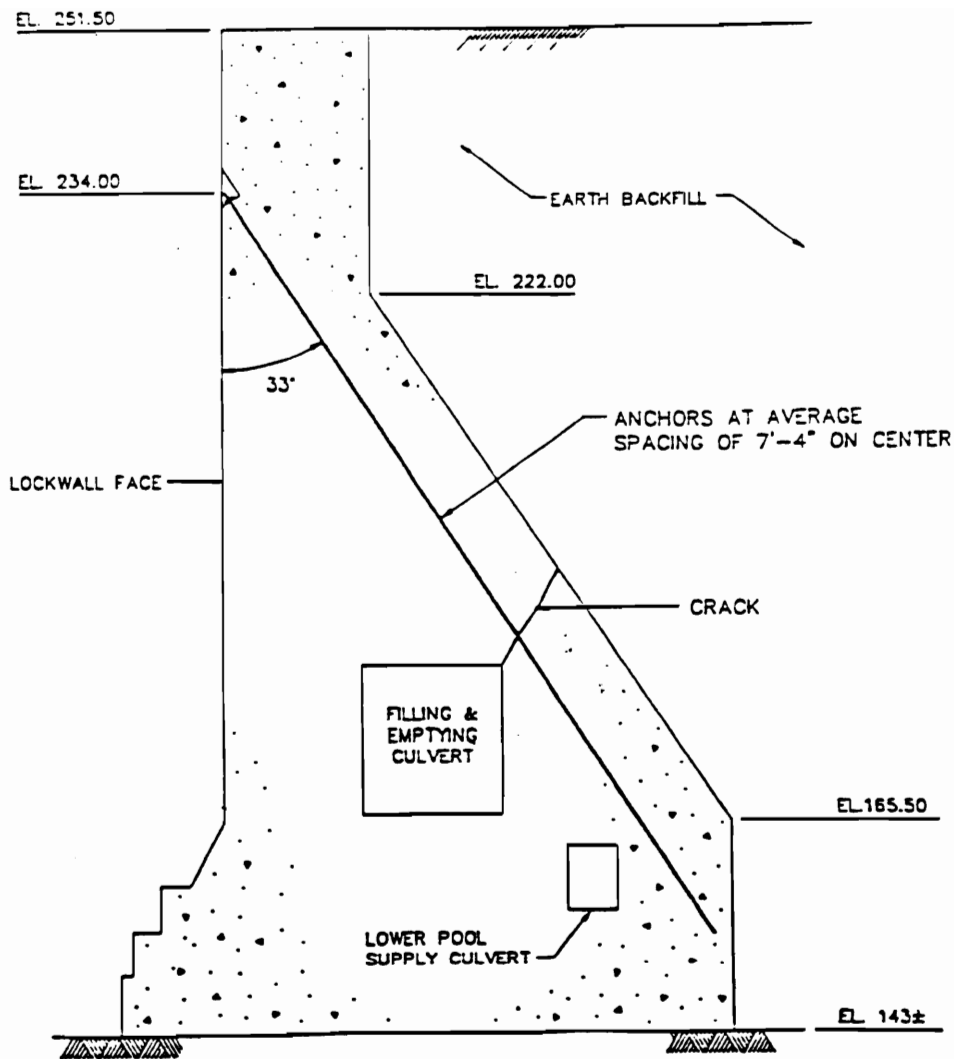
Typical Lock Wall Section for Eisenhower and Snell Locks
